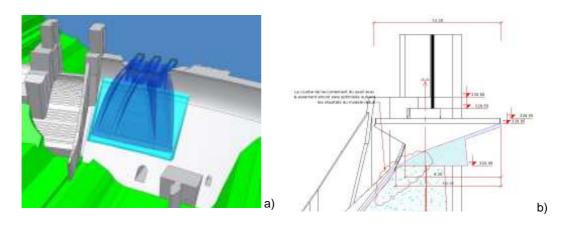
3D CAD view of the new PKW spillway (a) and a section of PKW outlet alveoli (b) *Vue 3D CAD du nouveau PKW (a) et coupe sur une alvéole de sortie (b)
